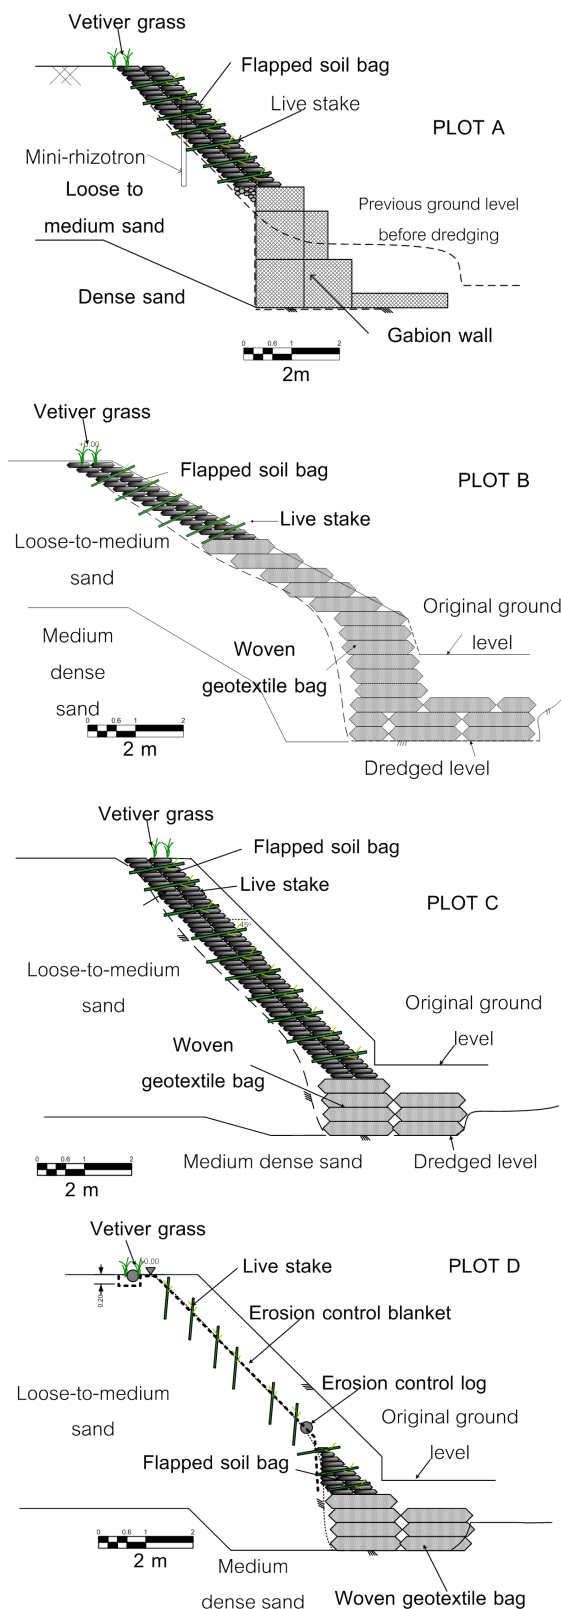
Schematic cross-sections of the bio-stabilization test plots
